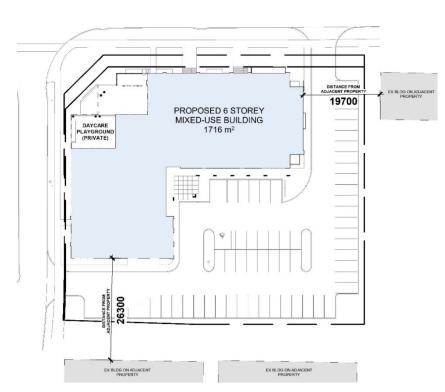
Site Diagram showing Distance of the Proposed Building to Neighbouring Buildings
